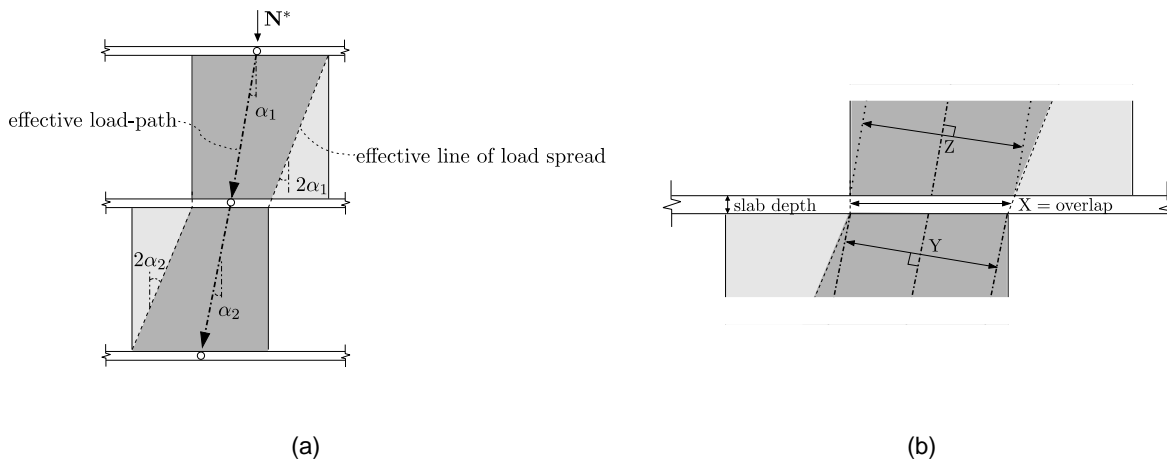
STM model: (a) overall geometry; (b) detail with main strut dimensions.
